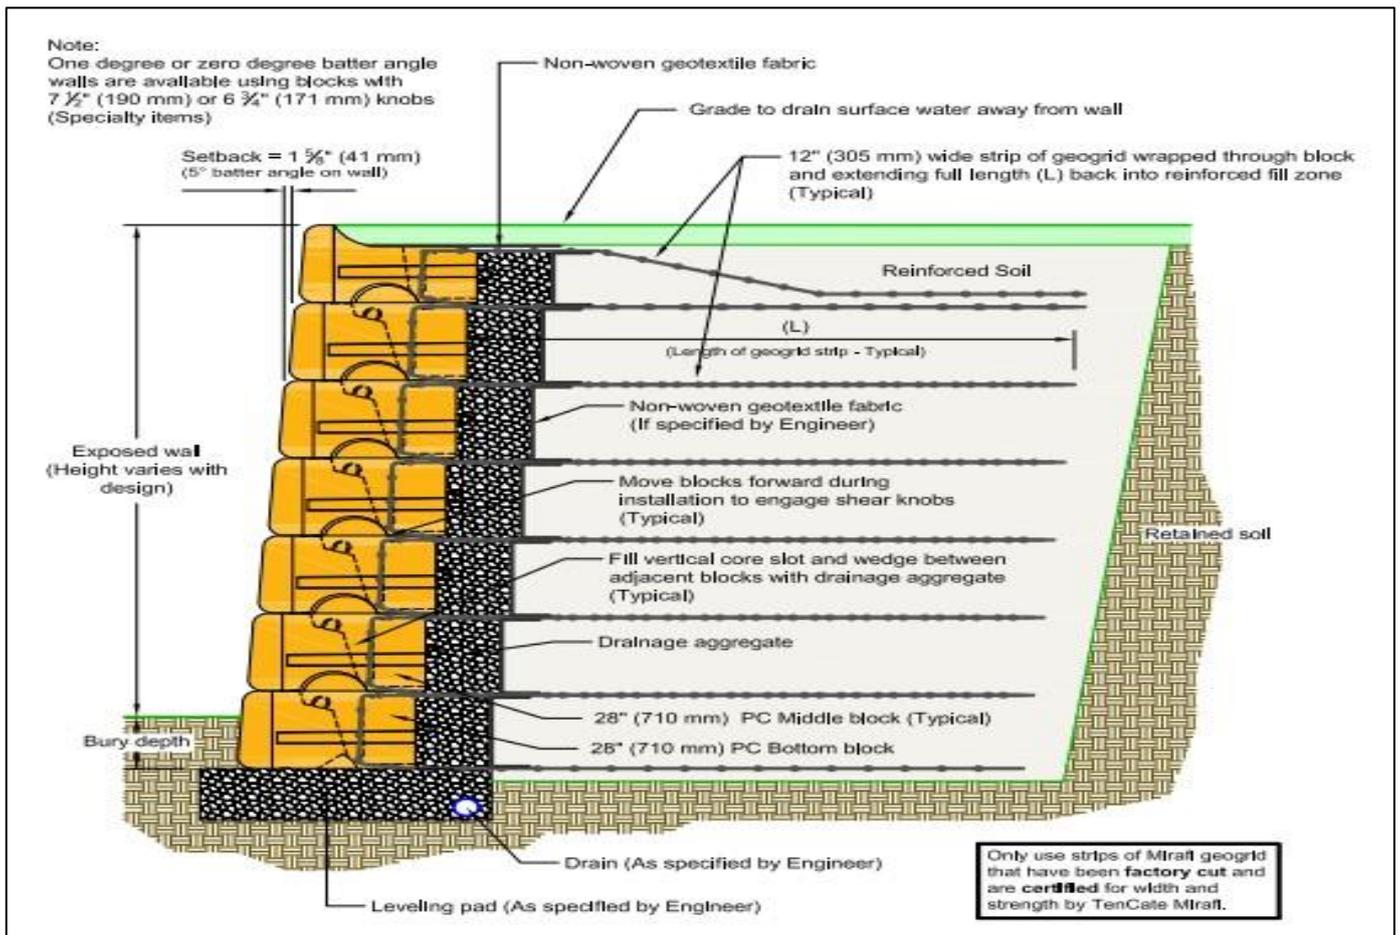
Typical Mechanical Stabilize Earth Wall Section (Redi-Rock 2020)
